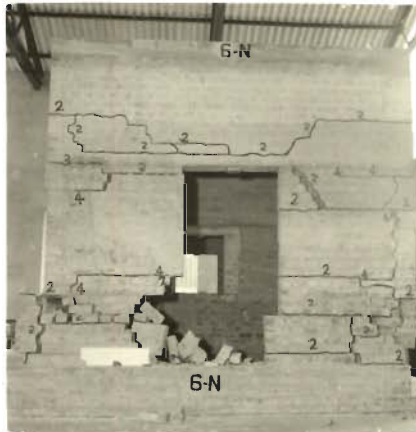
\_ NORTH WALL BROKEN INTO SEPARATE BLOCKS, BOTTOM PORTION OF LEFT PIER FELL DOWN (MODEL 6)
